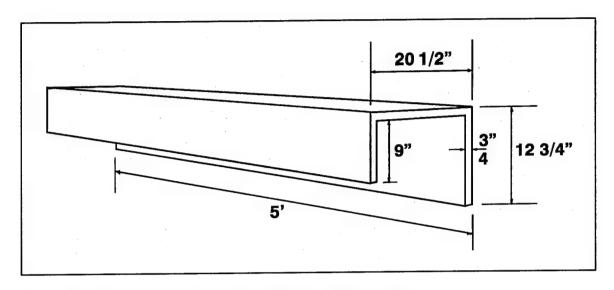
Polymer concrete channel cladding, Deadwood Dam
